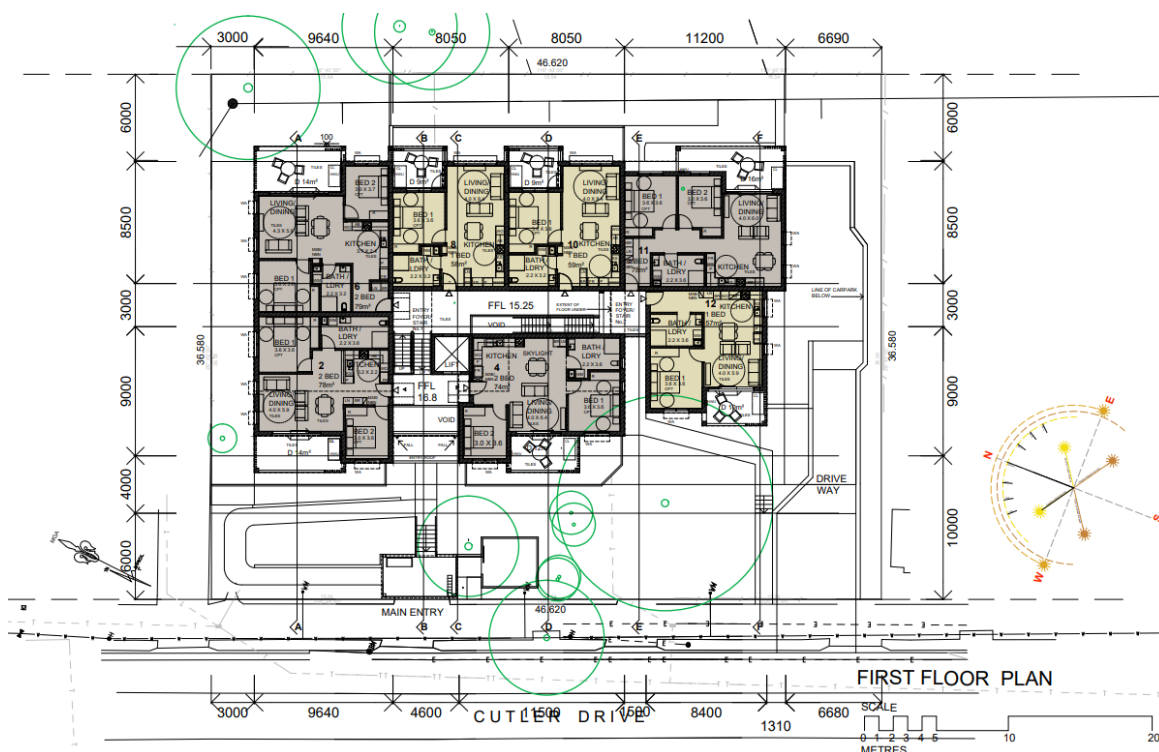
First Floor Plan, Source: Barry Rush & Associates Pty
